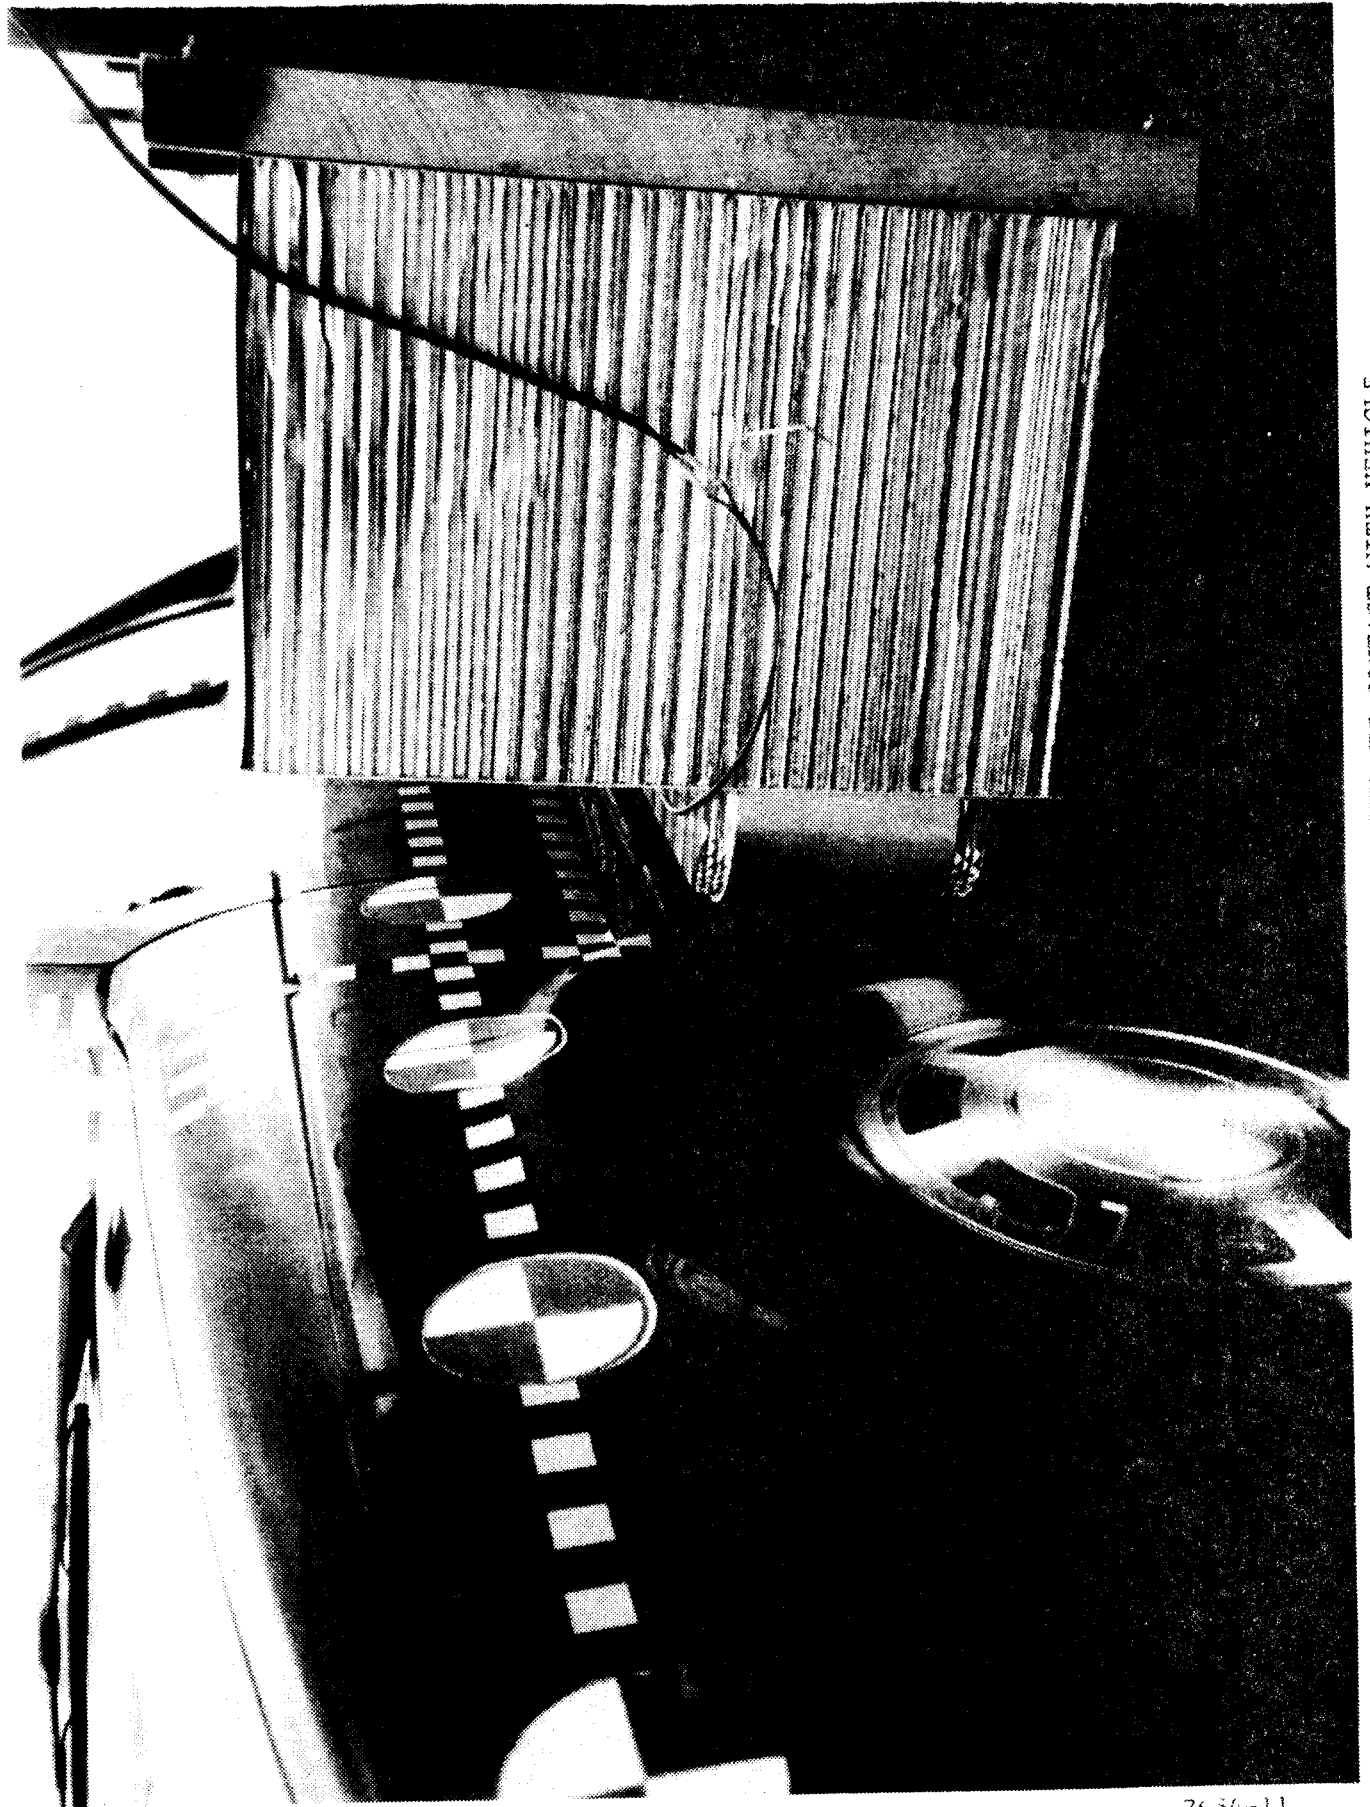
PRE-TEST LEFT SIDE VIEW NDB CONTACT WITH VEHICLE
